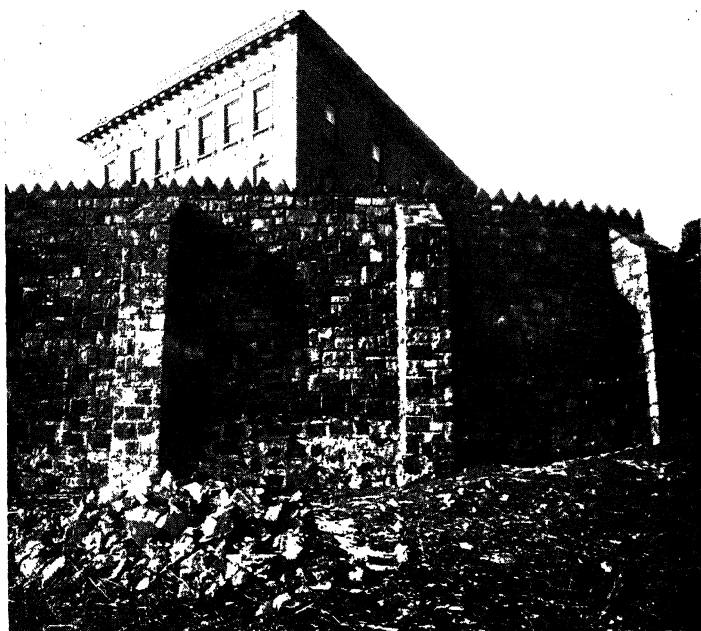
A buttressed masonry retaining wall, Weehawken, N. J.
